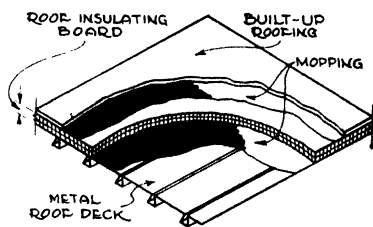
Metal Roof Deck, Roof Insulation Board, and Built-up Roofing
